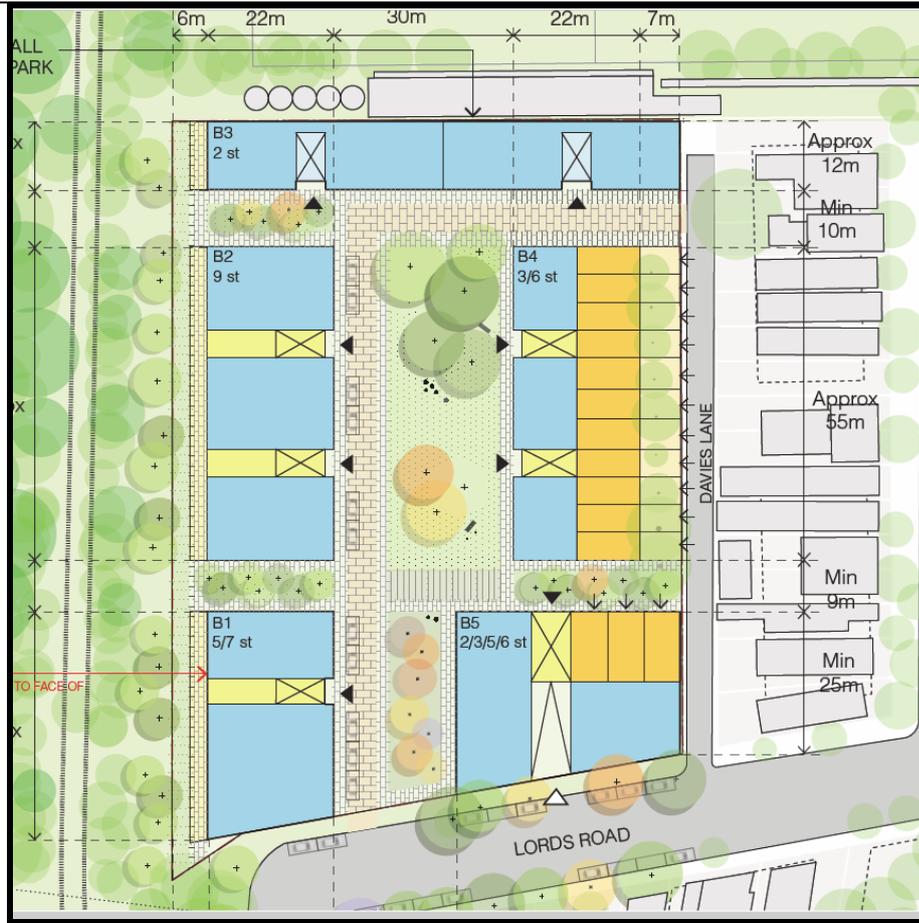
Proposed Master Plan for the site (Source: UDR, page 19)
